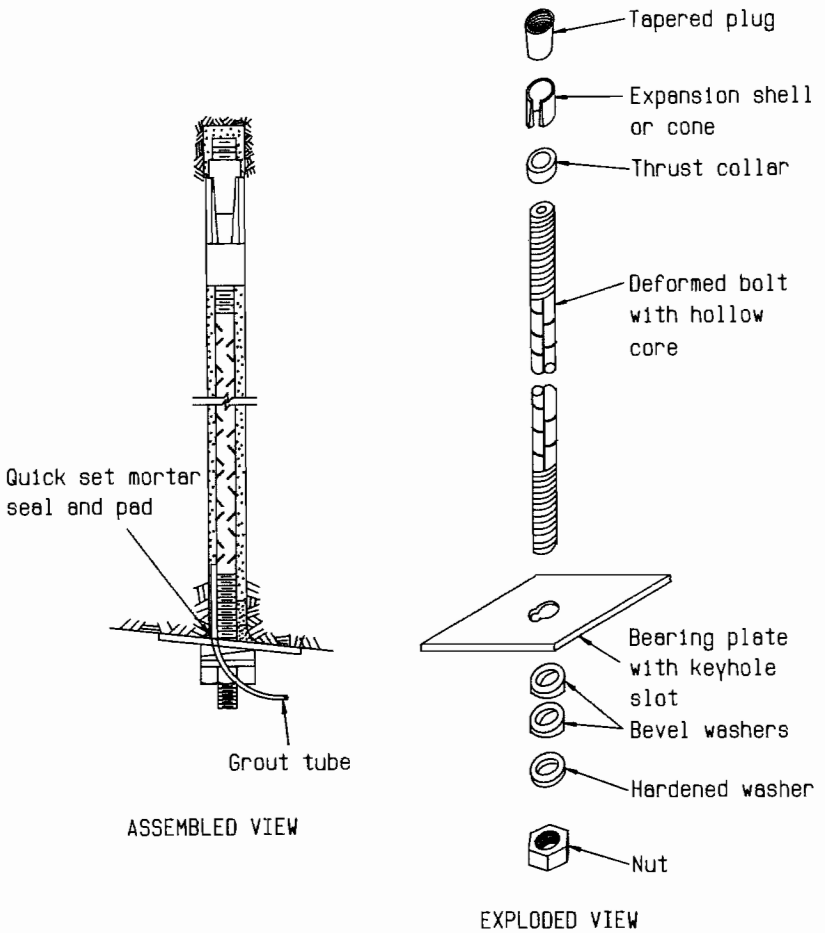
Hollow Groutable Deformed Bar Rock Bolt (U.S. Army, 1980).
